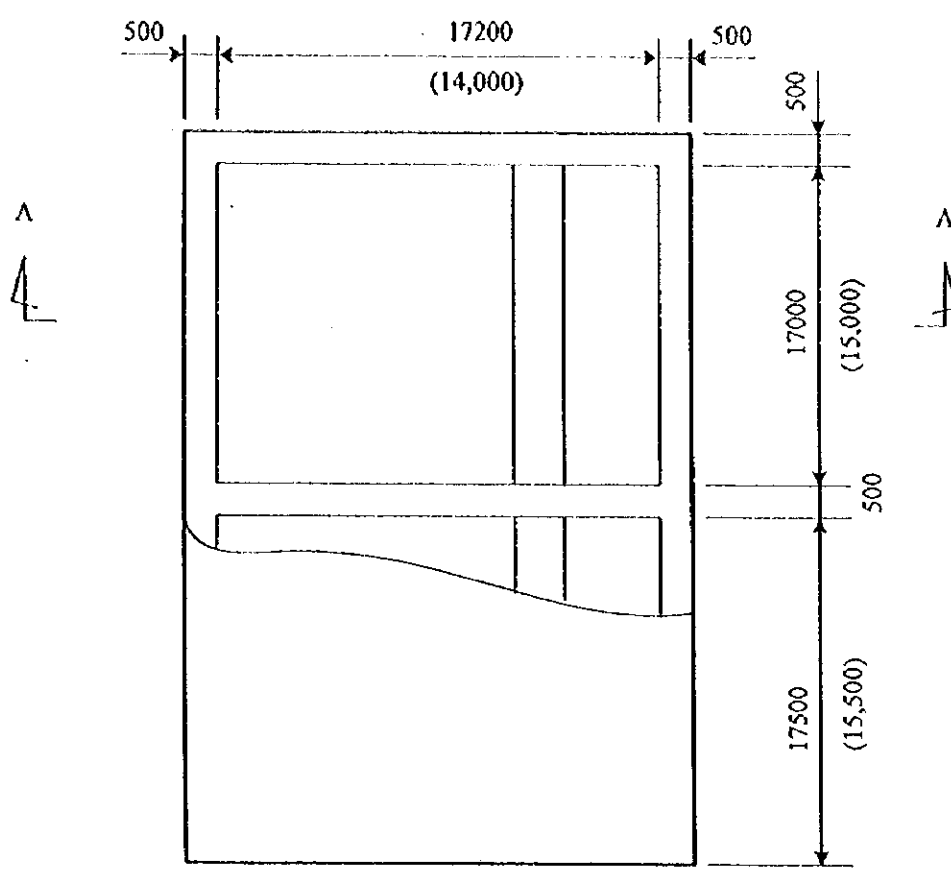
(3) Layout of Well Field (Plan3)
